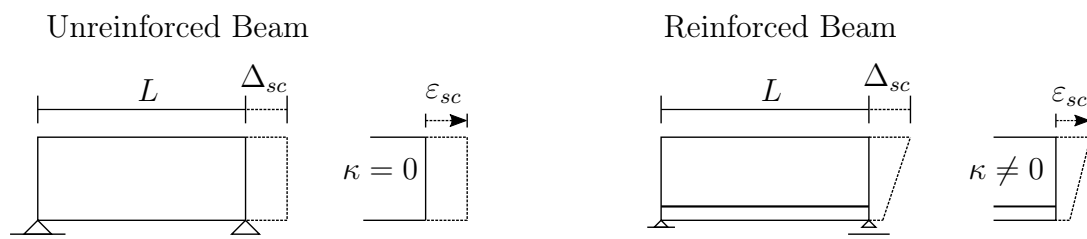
ASR expansion of an un-reinforced concrete beam and bottom reinforced concrete beam.
